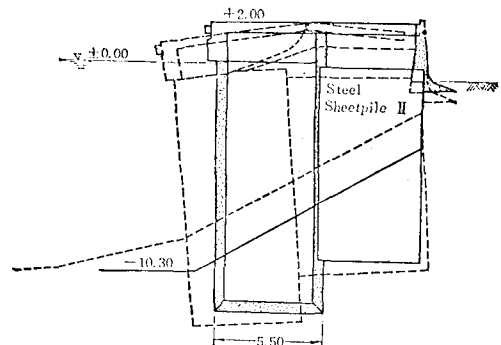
Cross Section of Quaywall in D Berth in Niigata Port
